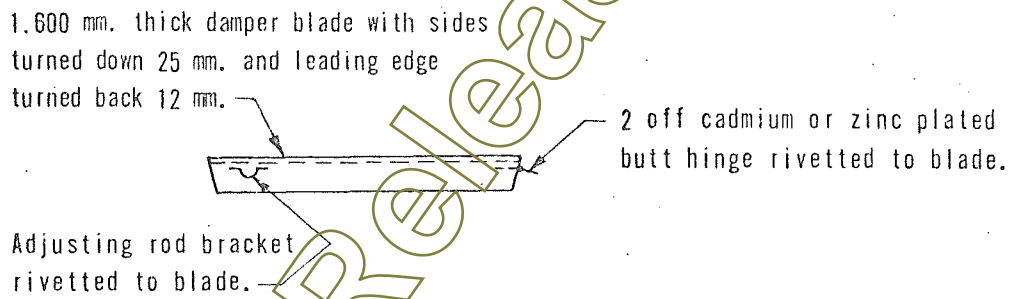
DAMPER BLADE UP TO 450 mm. WIDE
